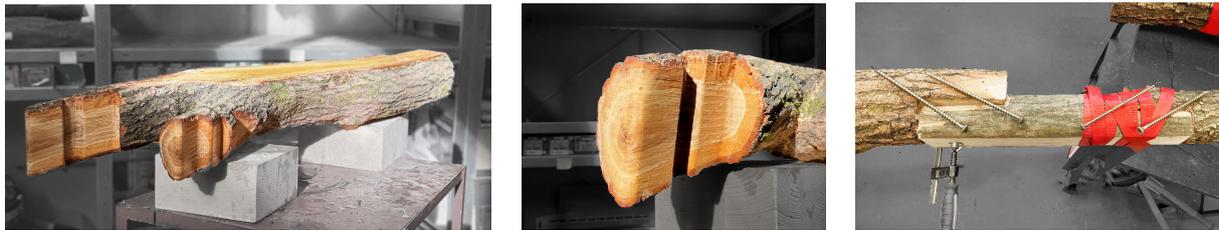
Resulting fabrication of the Interlocking joints for the off-knot connection: oak element with form fitting joints, detailed photo of the joint, fastening with fully threaded screws.
